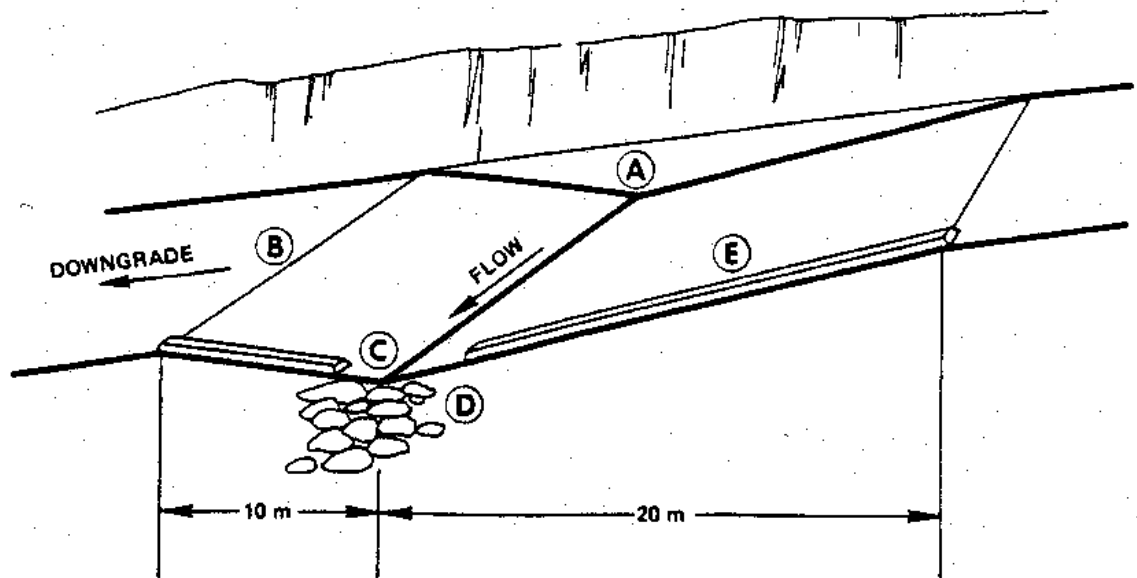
Design of outsloped dips for forest roads. A to C, slope about 10 to 15 cm to assure lateral flow; B, no material accumulated at this point - may require surfacing to prevent cutting; D, provide rock rip-rap to prevent erosion; E, berm to confine outflow to 0.5 m wide spillway. (Megahan, 1977)
